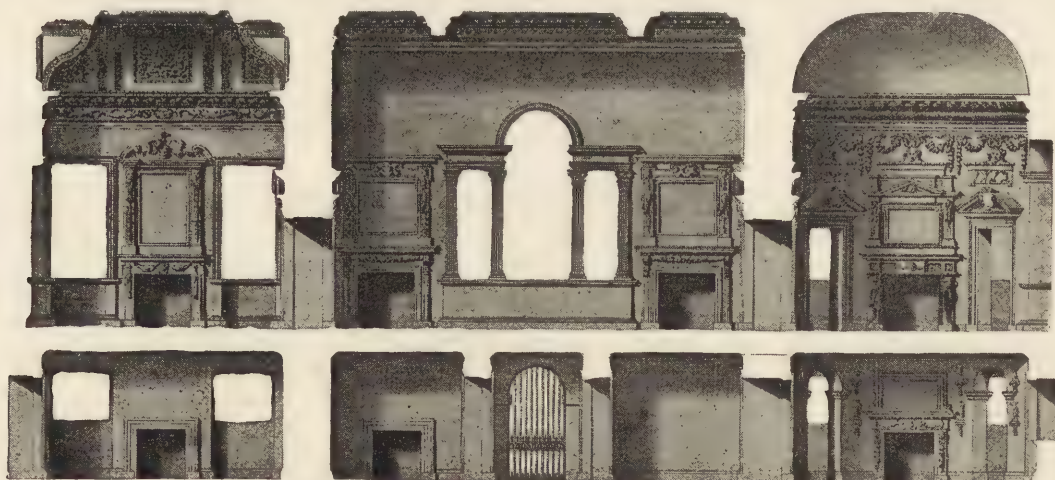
SECTION THROUGH F G D ON PLAN [fig. 115].
